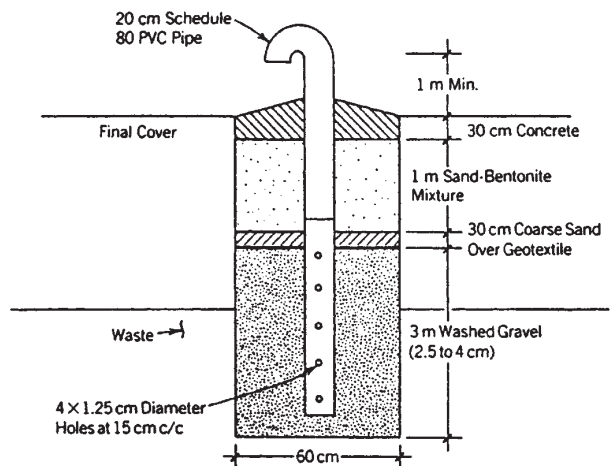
Typical detail of an isolated gas vent. (From Bagchi, A., *Design, Construction, and Monitoring of Sanitary Landfill*, Wiley, 1990.)
